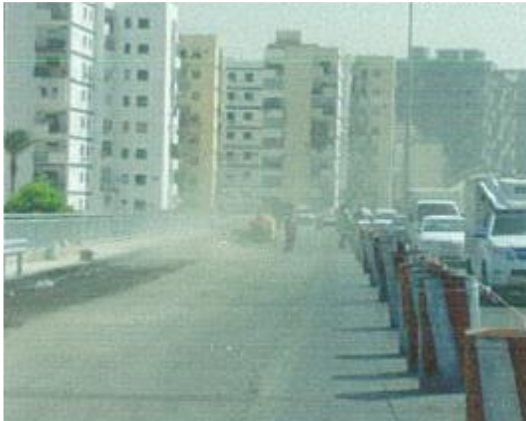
Cleaning the road by air compressor after removing of upper asphalt layer
